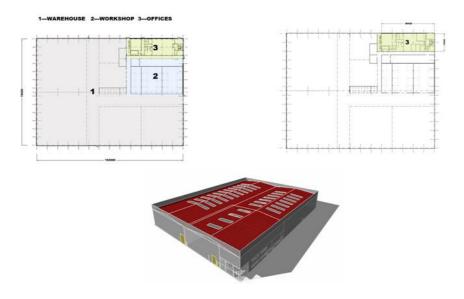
Ground Floor (left) and First Floor (right) plans and 3D image.
